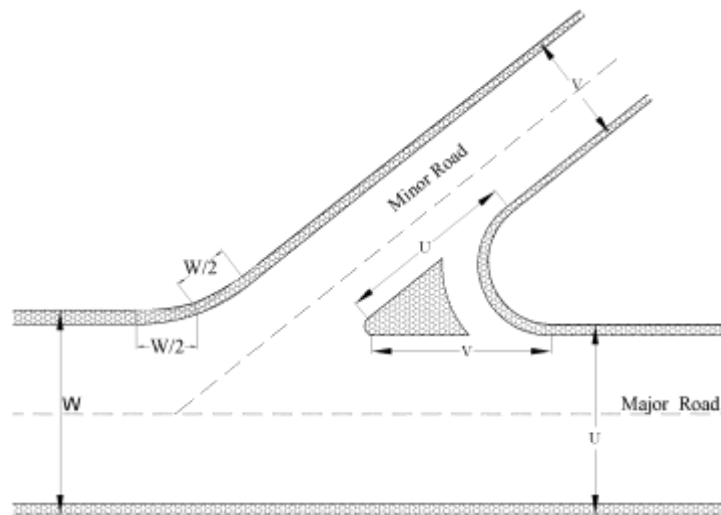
Road Junction (Roads meeting at less than 50° angle) Plan
